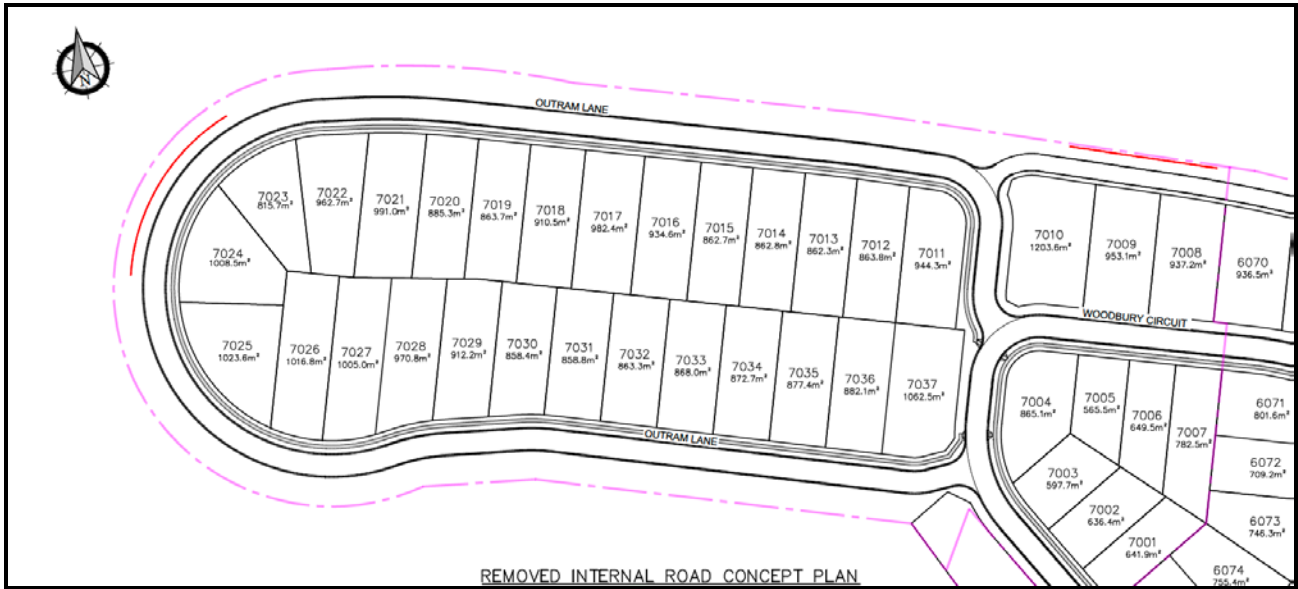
Proposed Stage 7 subdivision layout with the internal road removed.
